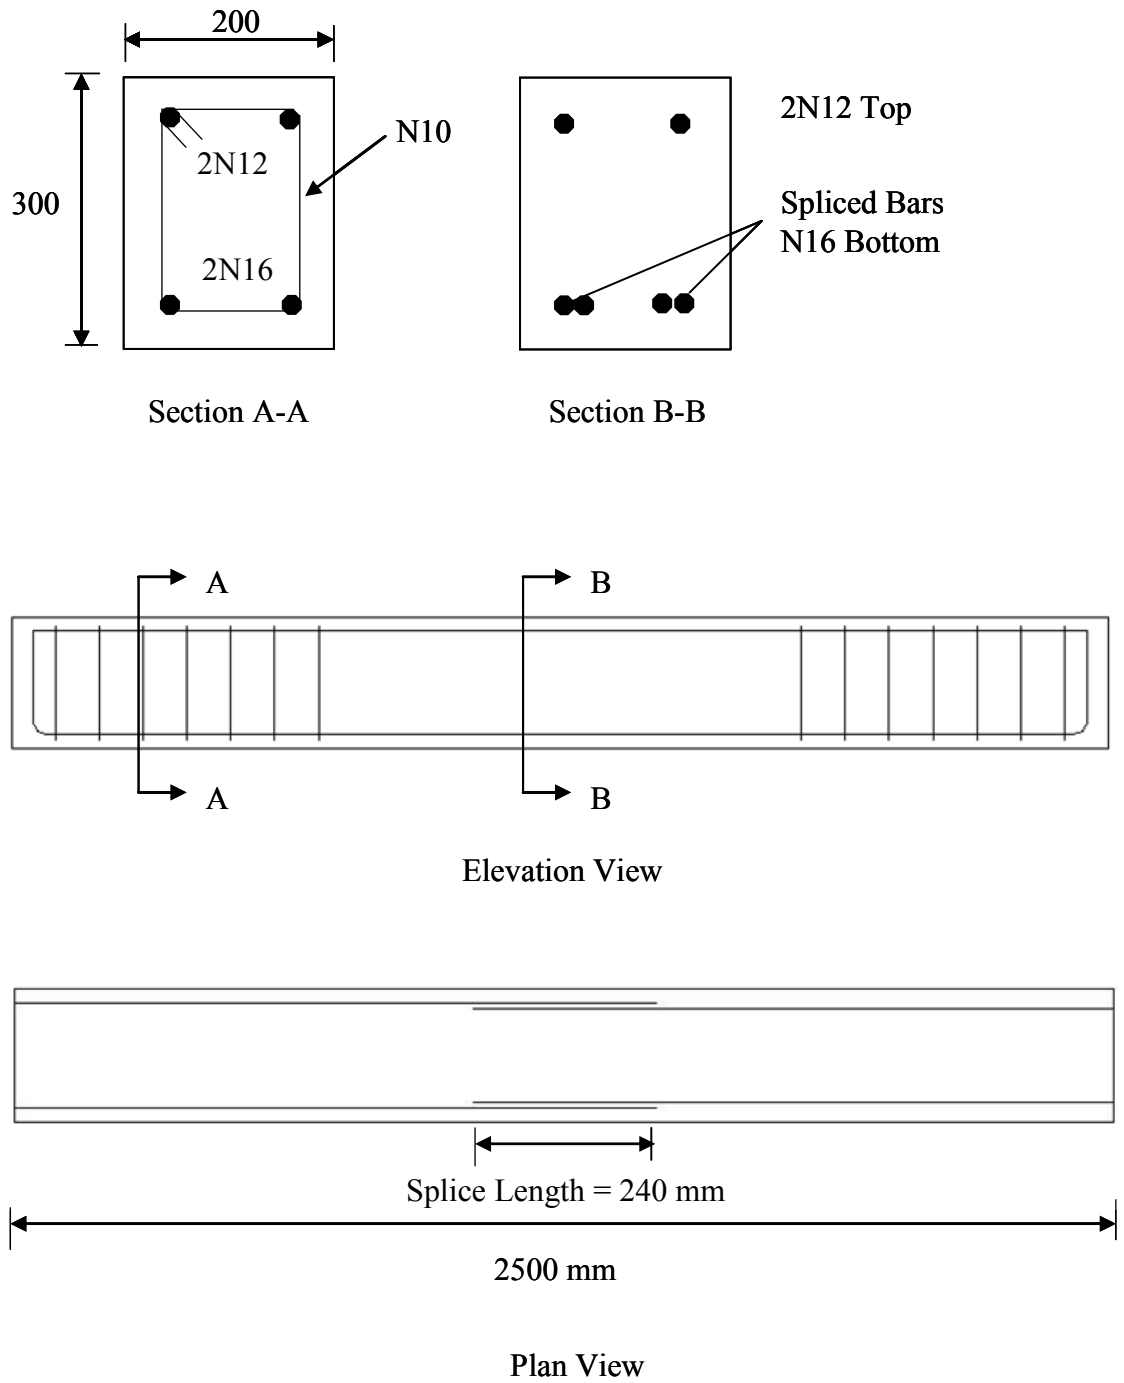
Geometry and Reinforcement Arrangement for Beams N-D-2.2 and H-D-2.2
